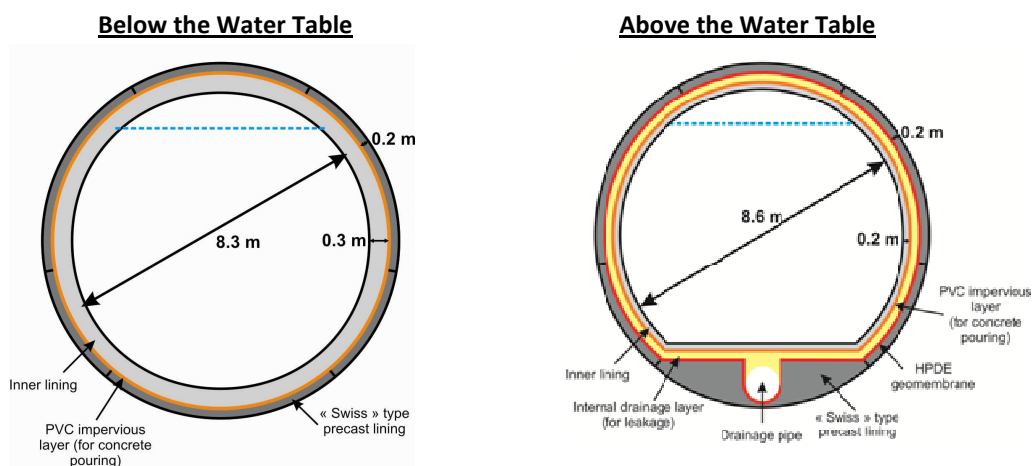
Typical Tunnel Lining Details for Tunnel Alignment Option 00.1
